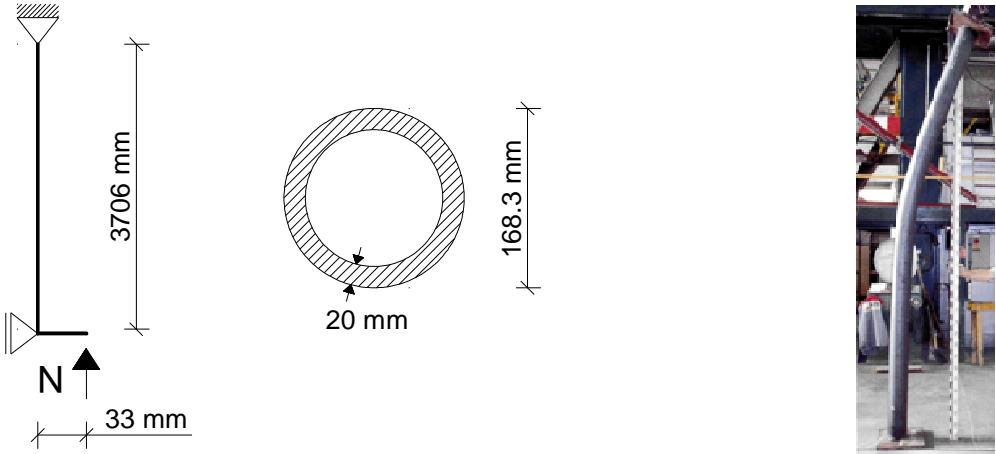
Static system and cross-section of the columns tested in 2005 and 2006 (left); column tested in 2006 after fire test (right).
